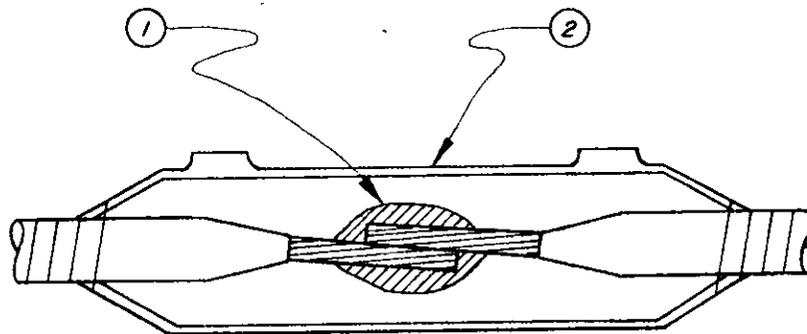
# EXHIBIT III B INSTALLATION DETAILS OF GALVANIC ANODES
